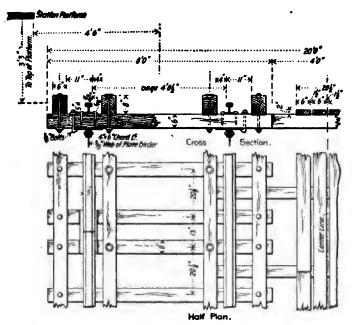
Track and Floor System; South Side Elevated Ry. (Chicago).
